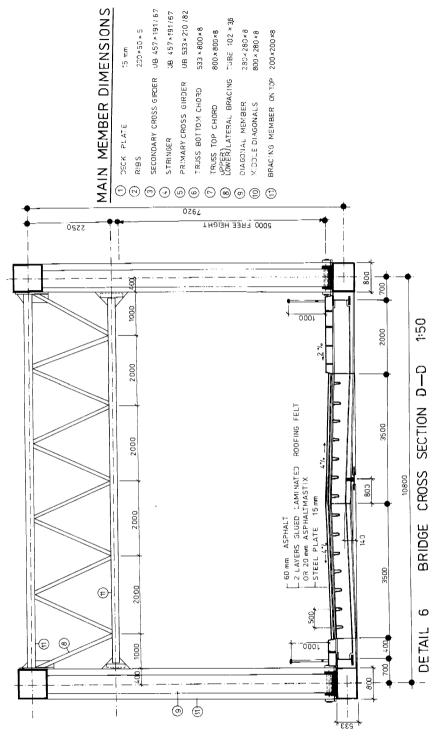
Access bridge—(a) elevation (courtesy of Frank Hyder, Leipzig, Germany)
